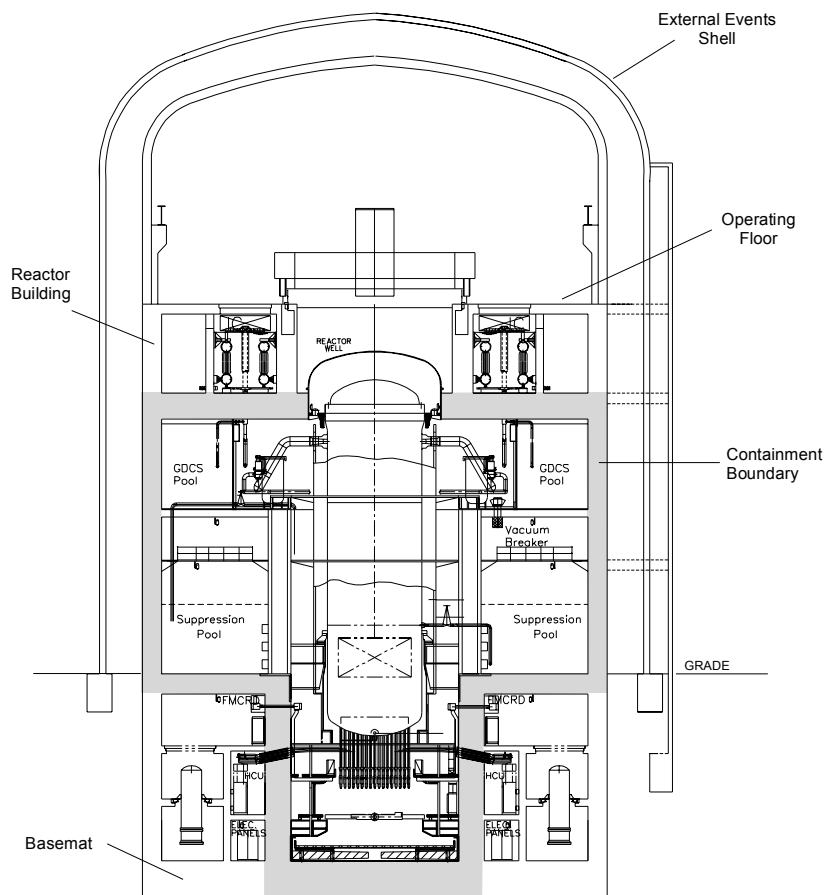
ESBWR reactor building arrangement, Section B-B, 90° - 270°.
